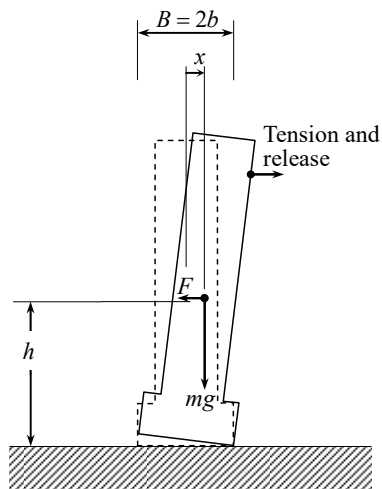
Rocking Specimen (Reinforced concrete column on concrete slab)
